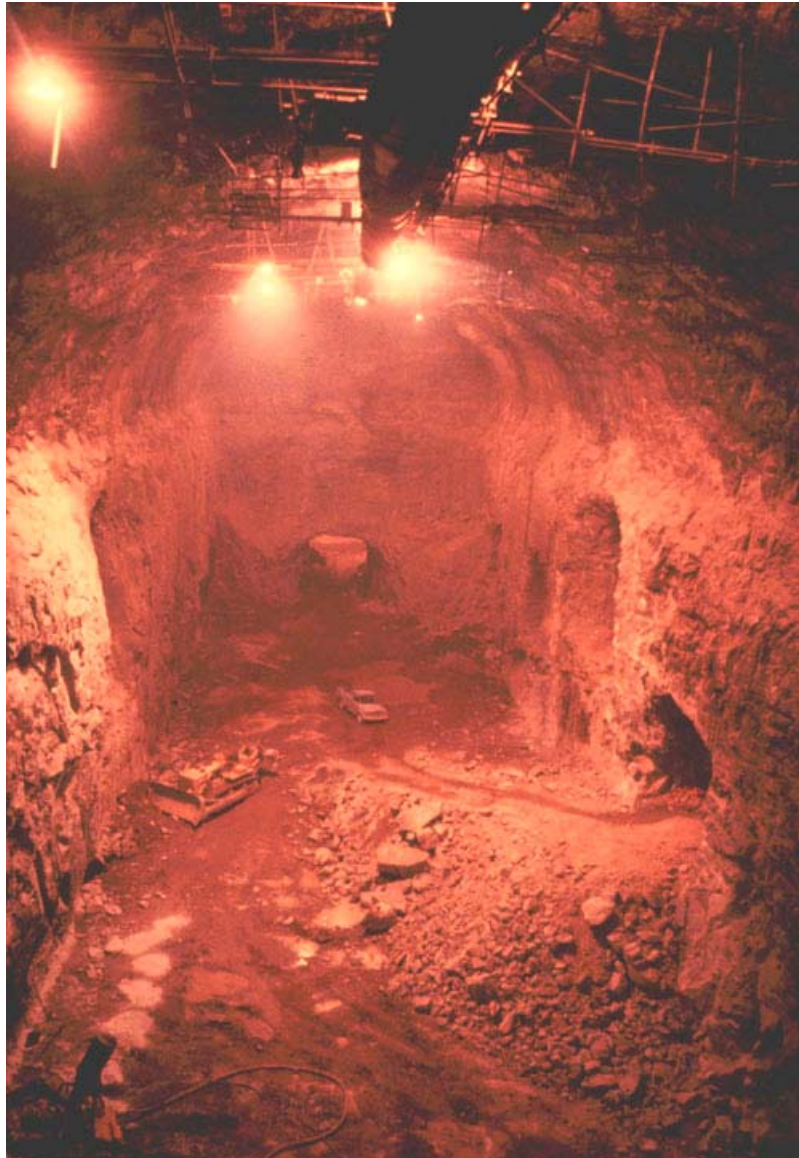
A view of the 25 m span Rio Grande power cavern during excavation of the lower benches.
